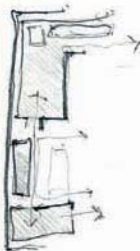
Ground floor plan of Stairway, extending urban surface for everyday praxis.
